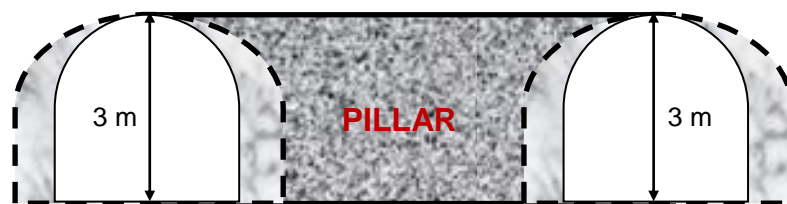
CHAMBERS AND PILLARS — CROSS SECTION
